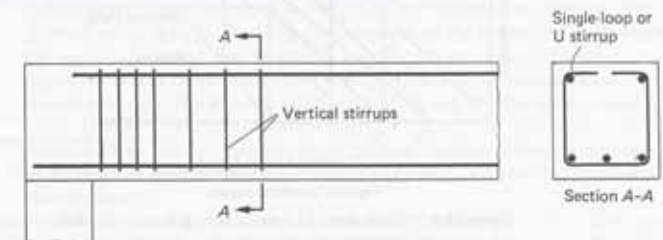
Vertical stirrups as shear reinforcement.
